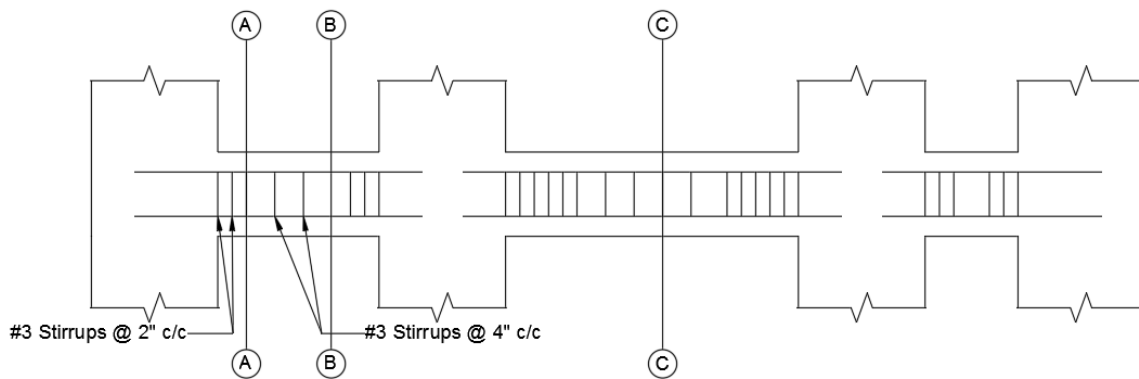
Beam rod detailing for Y-axis 3F
